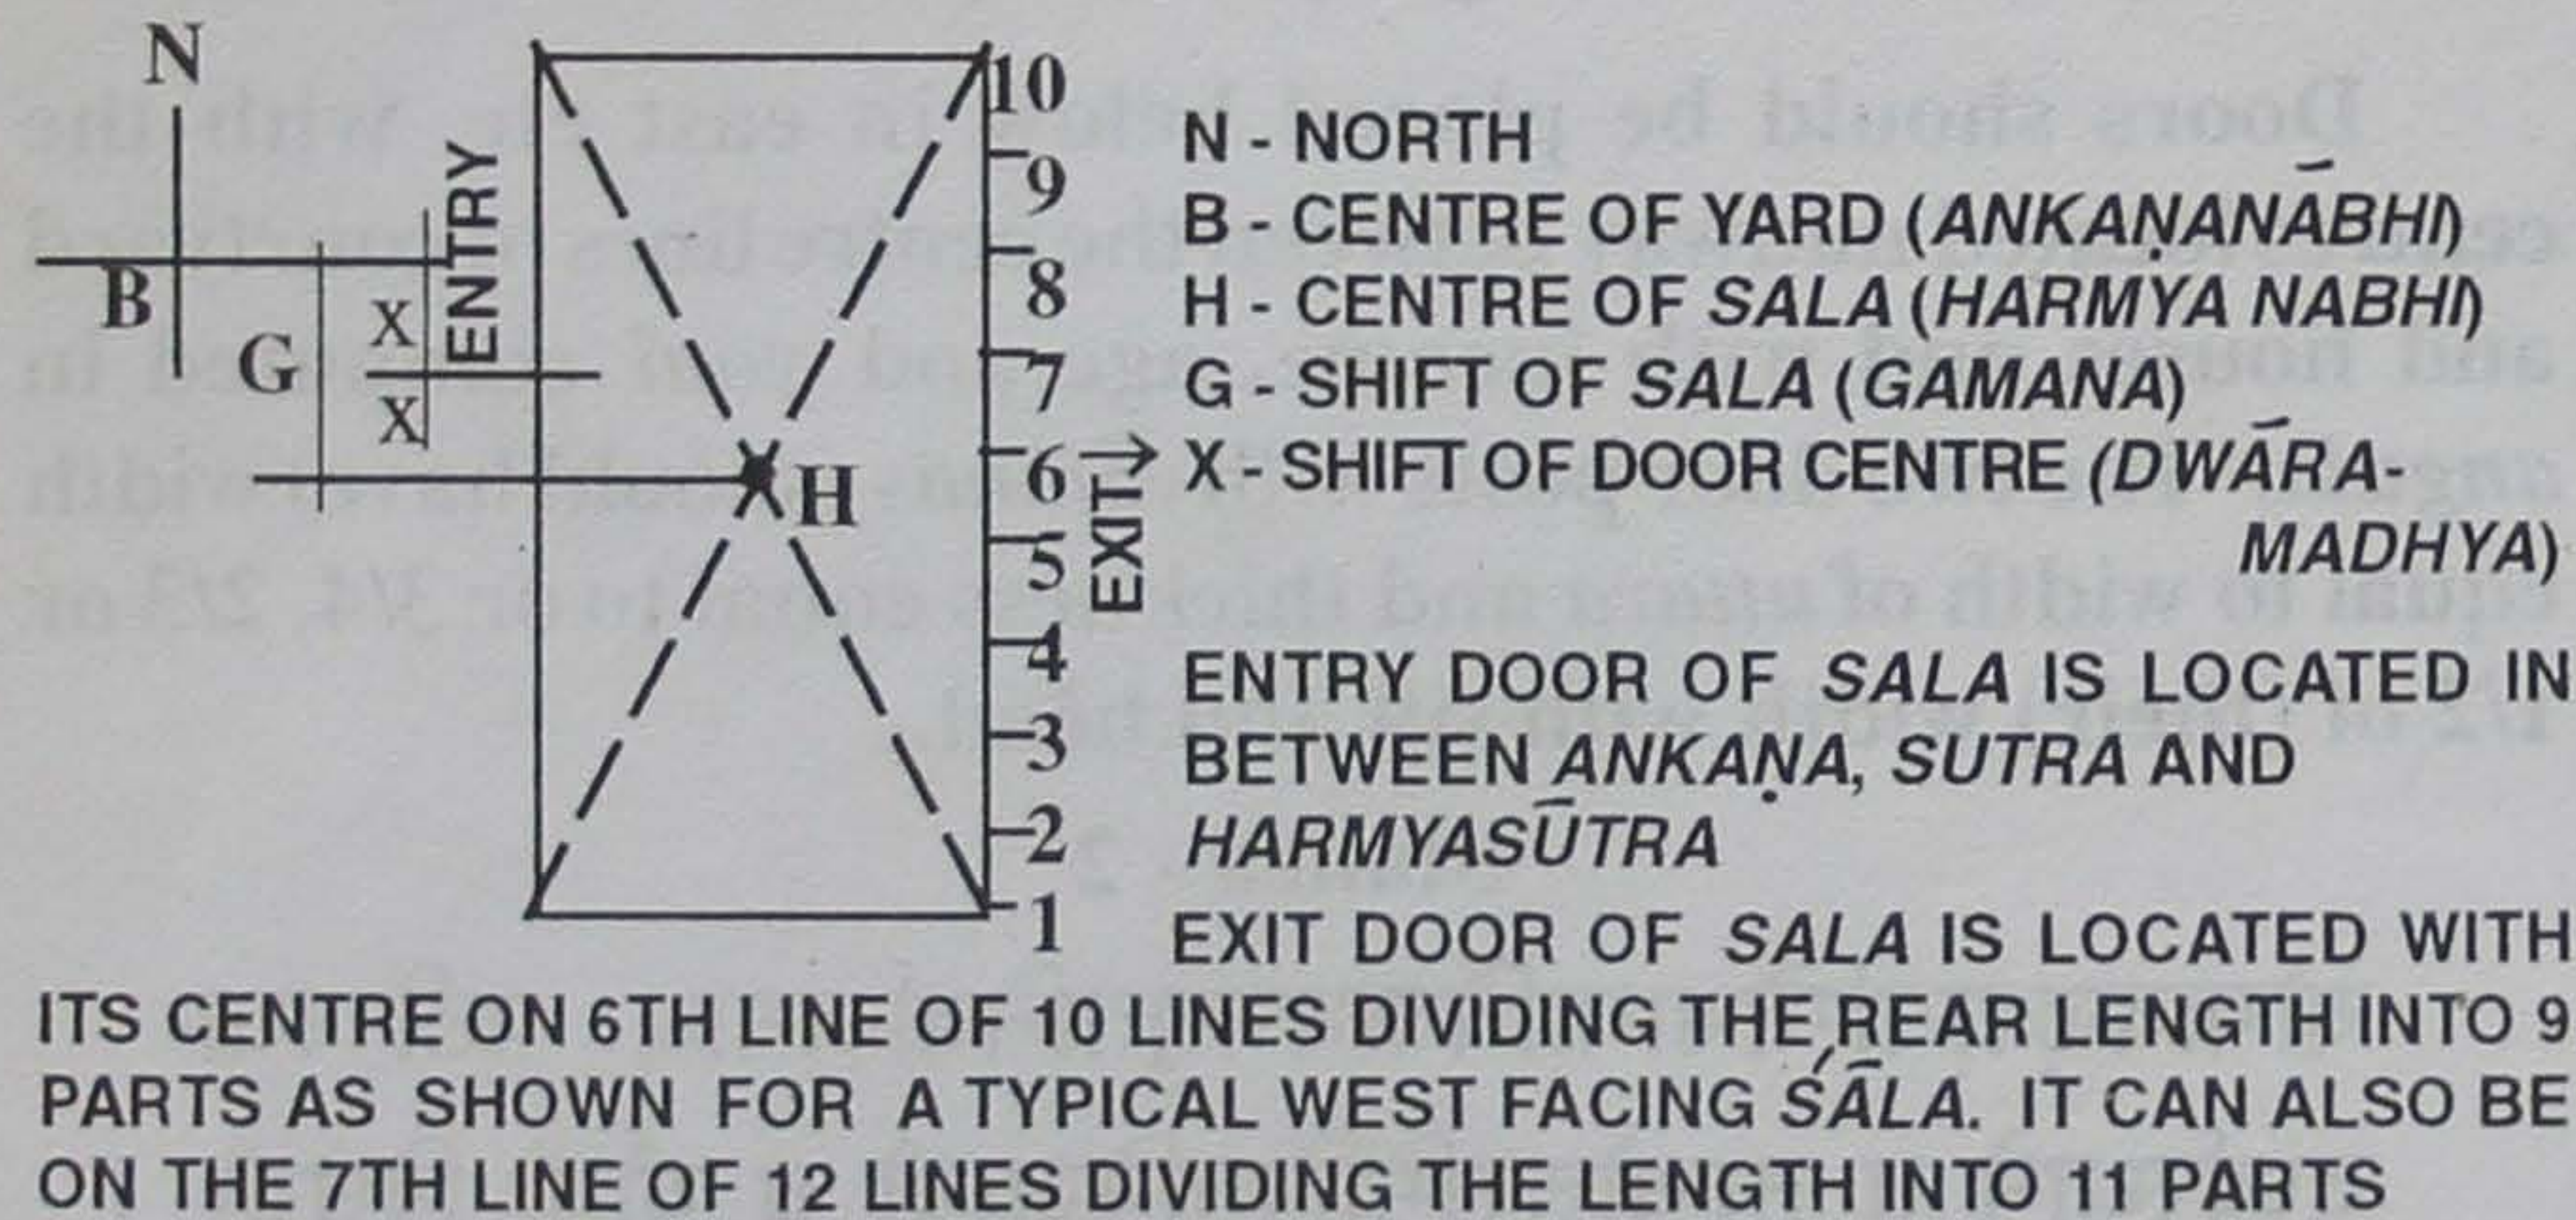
LOCATION OF MAIN ENTRY AND EXIT DOORS OF BUILDINGS
